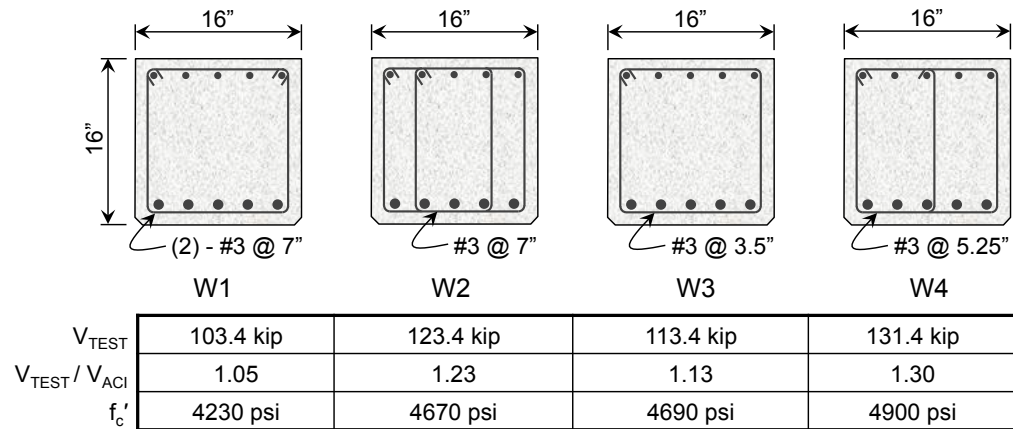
Details of specimens tested by Anderson and Ramirez (1989).
